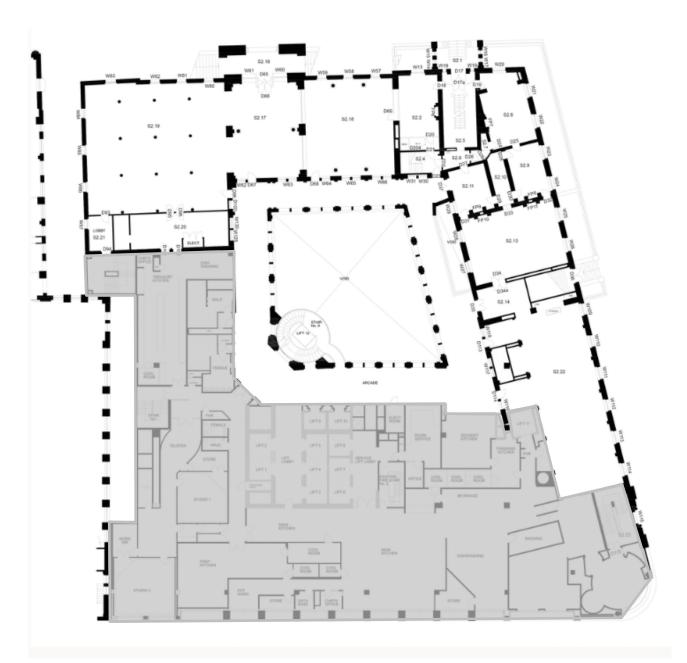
Reference plan – Ground floor (area not addressed in this report shaded grey).
